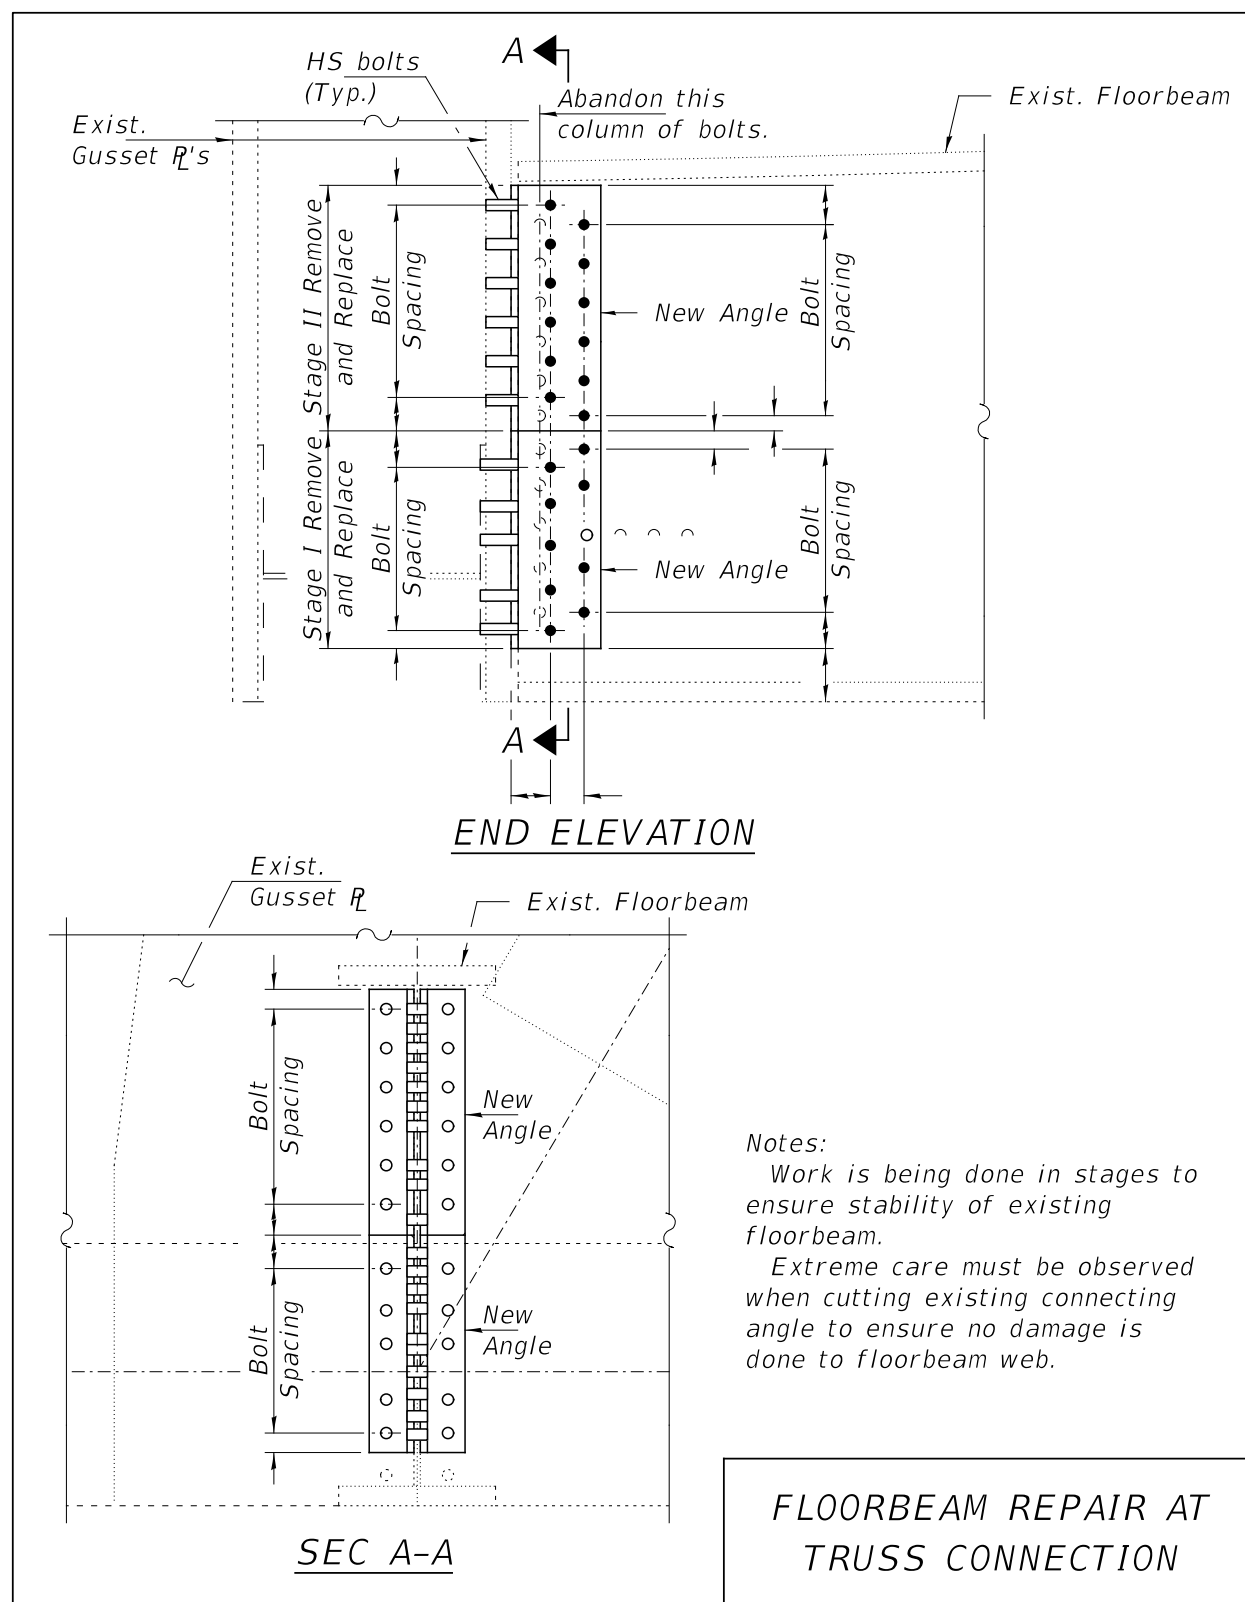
Floorbeam Repair at Truss Connection
